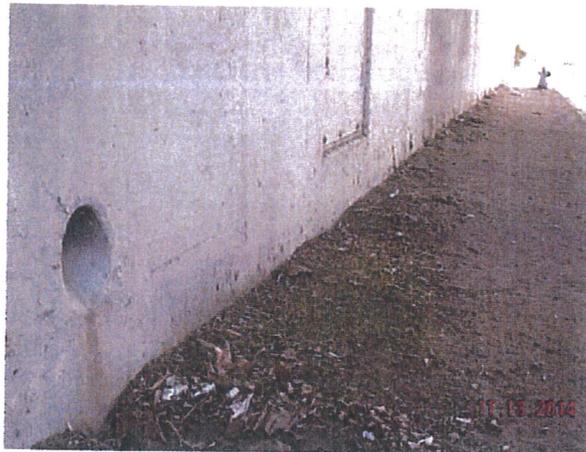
Bridge 50-0326L/R/CR-1 south abutment
